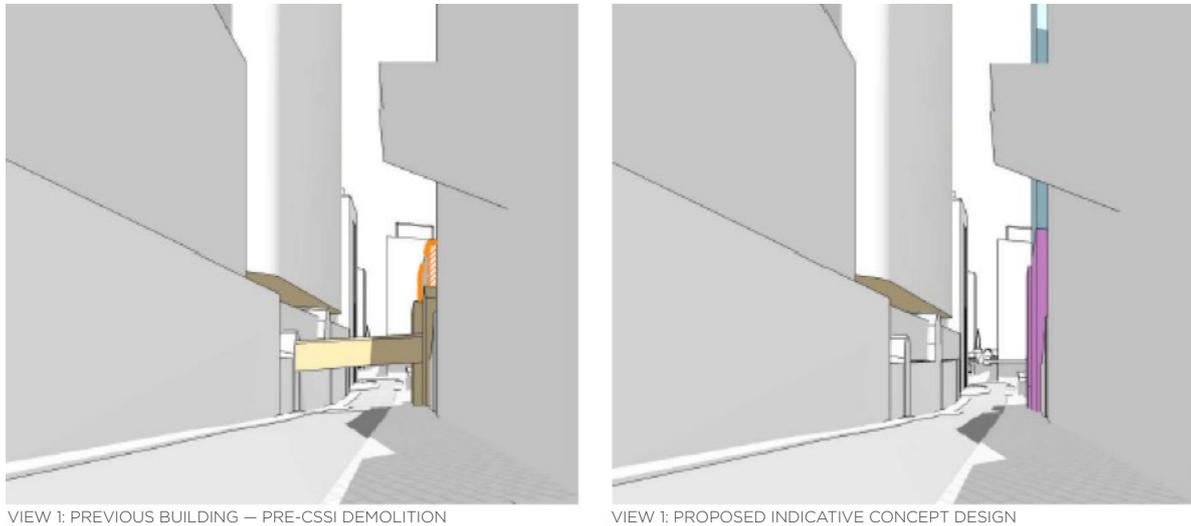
Pre-demolition view (right) and proposed view (left) from the western side of Denison Street at the junction with Berry Street – MLC building shown in orange, pre-demolition building form shown in brown, CSSI Approval shown in pink and OSD building envelope shown in blue.
